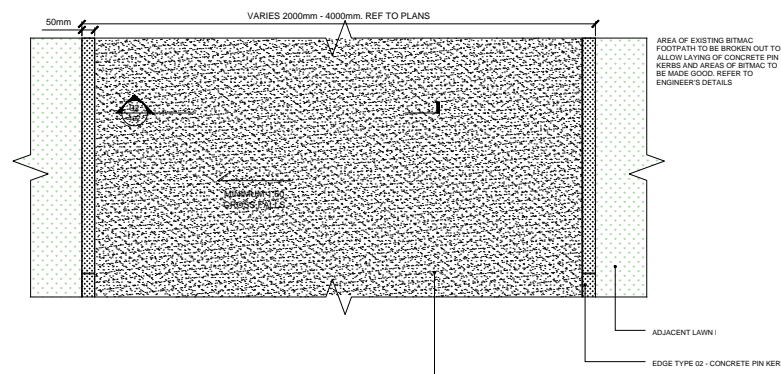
Surfacing Typical Detail (not to scale)
